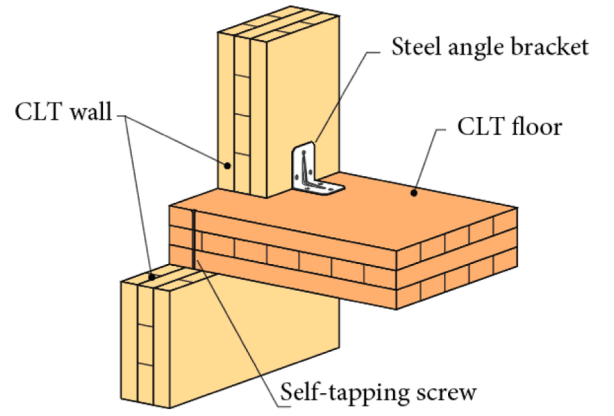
Typical CLT floor-to-wall connections in platform-framed construction (end support as A in Fig. 1).
